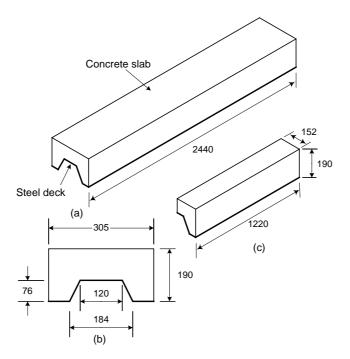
Composite slab dimensions (mm). (a) One deck corrugation, (b) Cross section, (c) One-quarter model
